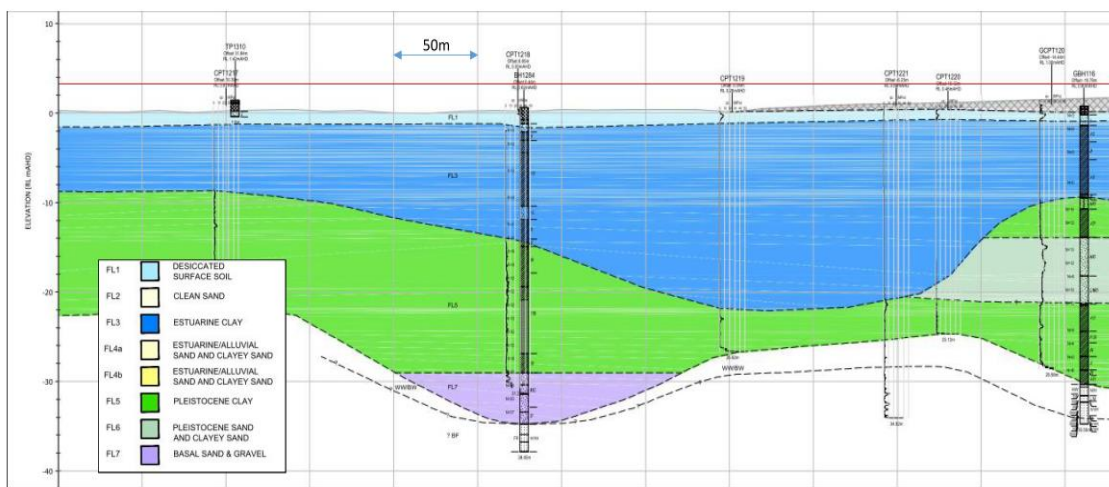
Geotechnical long section at south of Harwood bridge (FL3: very soft to firm clay)
